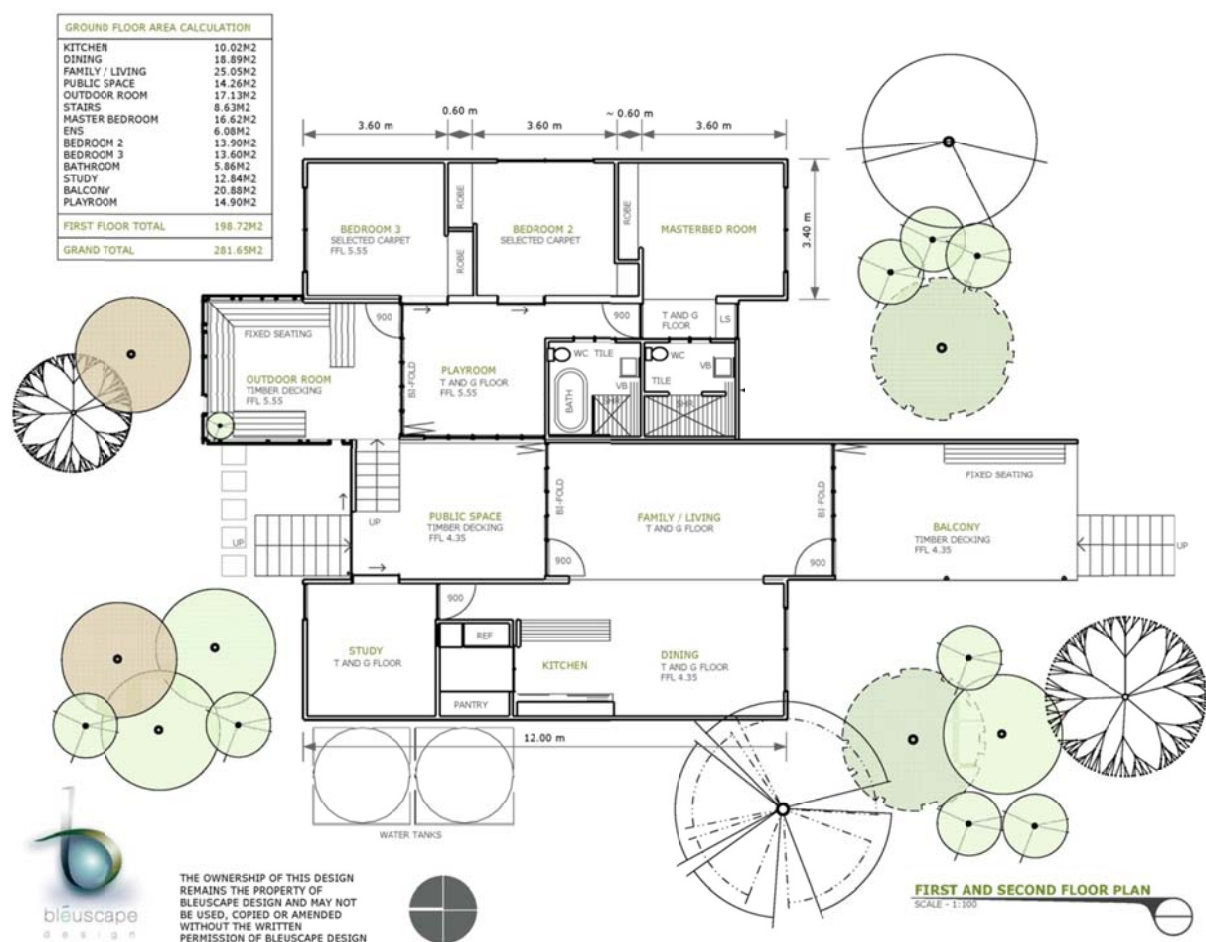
Bleuscape Design – The New Queenslander – First Floor Plan
